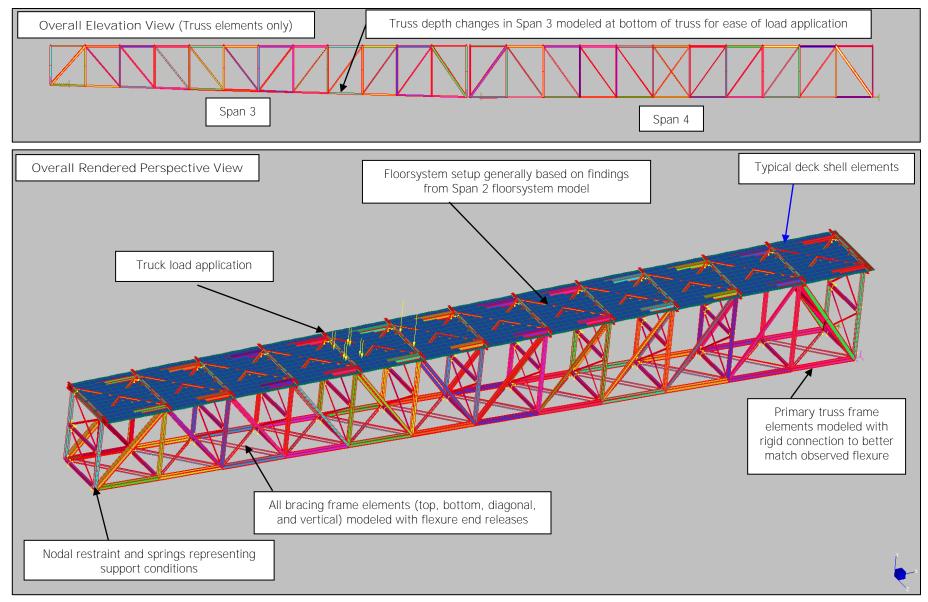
Model Overview of Span 3 Truss FEM illustrating test truck on the bridge
